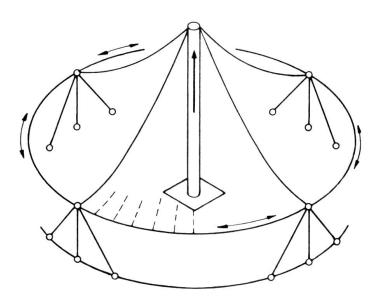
Structure with a lower circular ring. (No horizontal loading of foundation).
